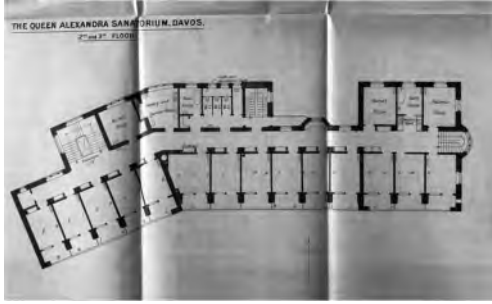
Typical floorplan of the 2nd and 3rd floor (source: Staatsarchiv Thurgau StATG 9'11, 5.0.0.1/0).
